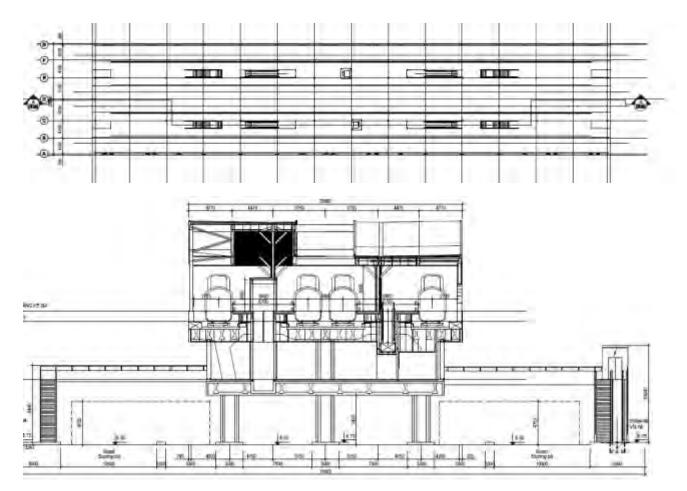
Plan and Cross Section of Four Tracks Station (elevated)
